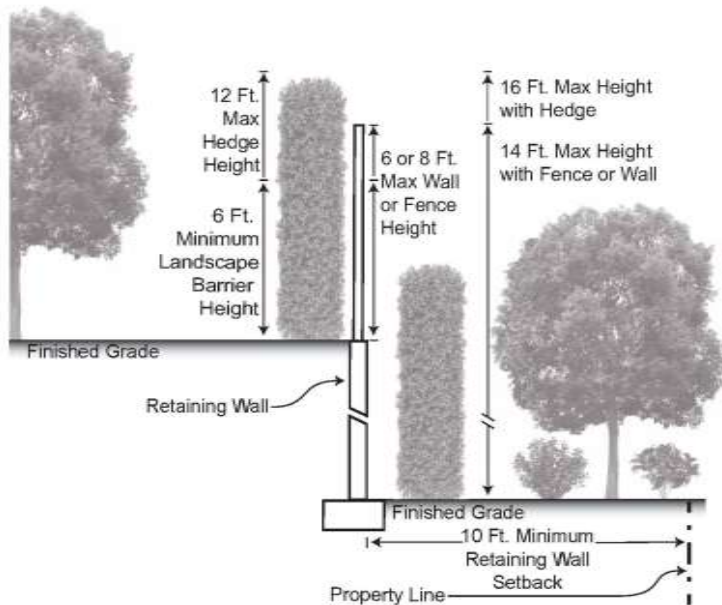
F.10.C - Height Requirement for Incompatibility or R-O-W Buffers With Grade Changes Using Retaining Walls
